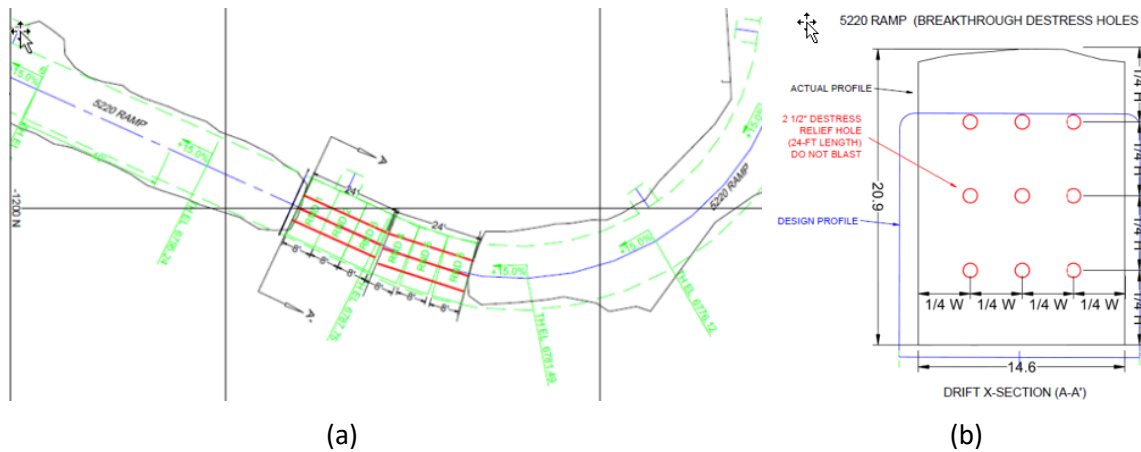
De-stress relief holes in the pillar presented on (a) plan view and (b) section view
